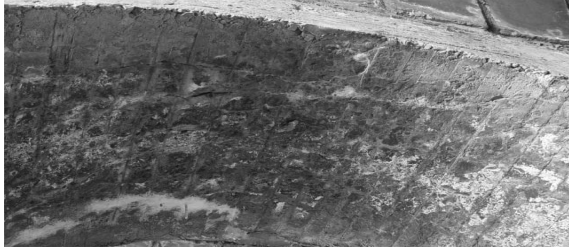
Corrosion of steel bar in higher edge of cap beam
